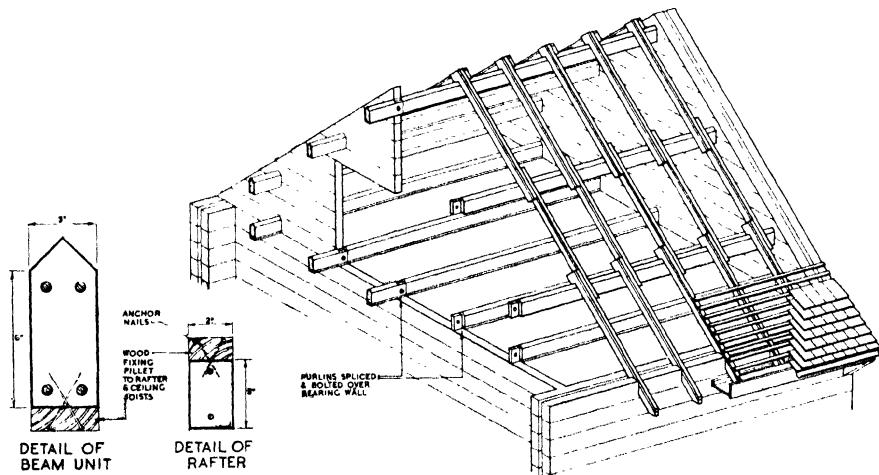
PITCHED ROOF WITH R.C. PURLINS AND RAFTERS
